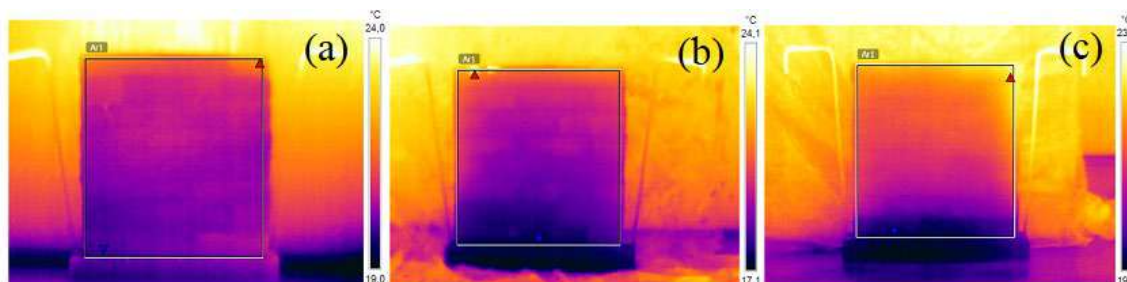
Sample PB2: a) dry wall; b) humid wall; and c) wall at 28 days
